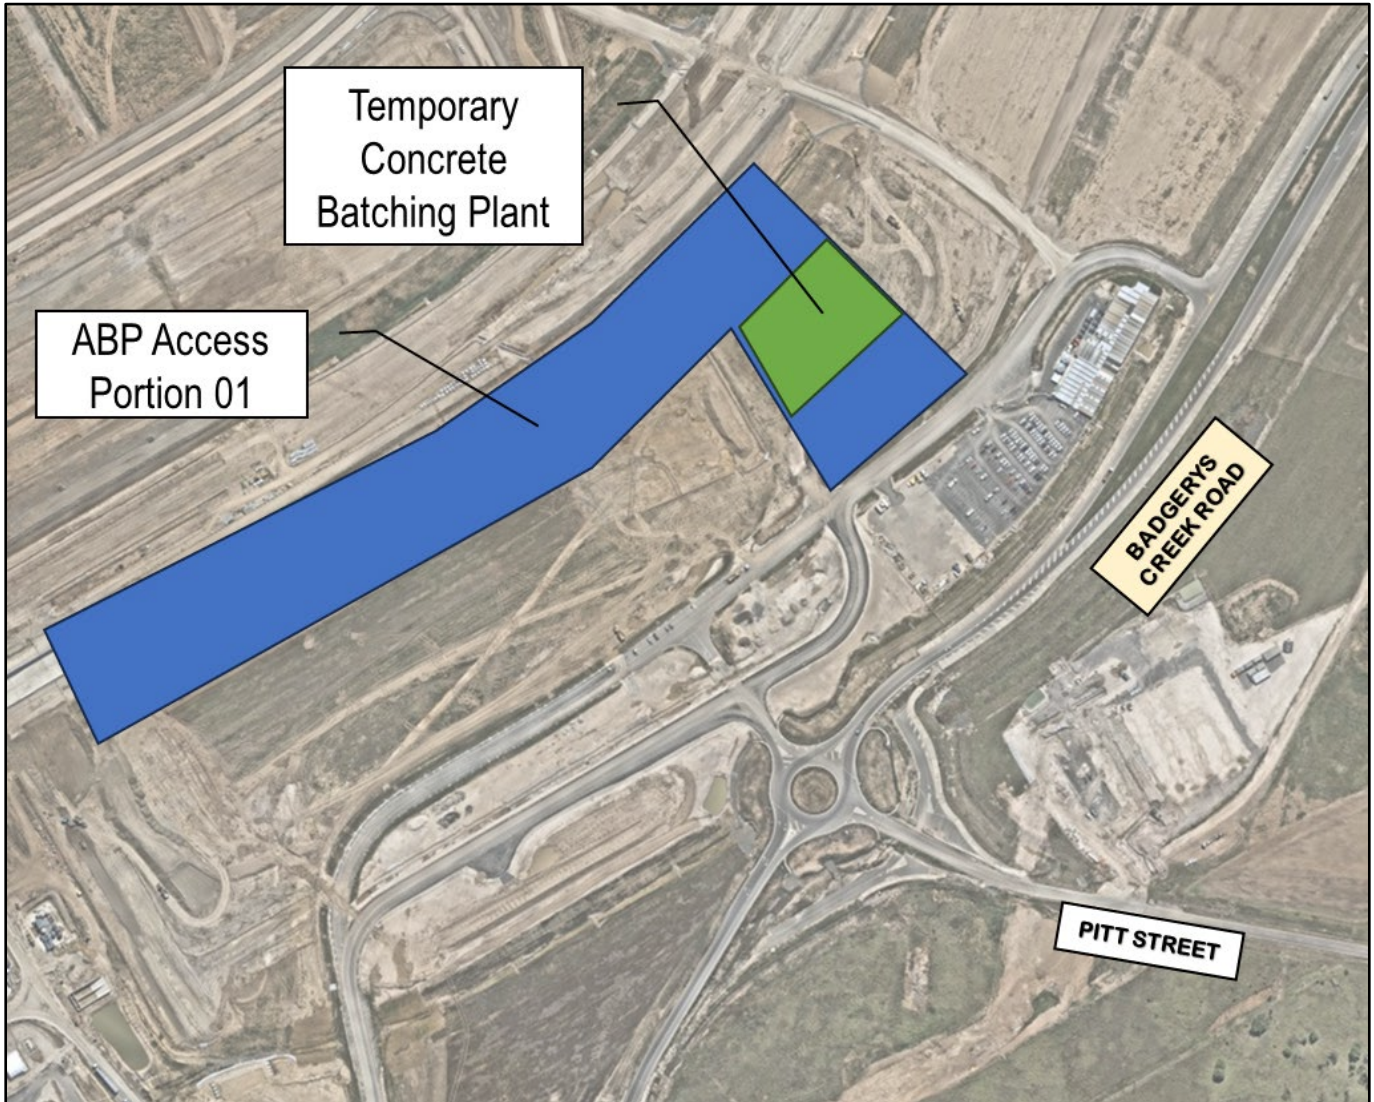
ABP TEMP CONCRETE BATCHING PLANT LOCATION
